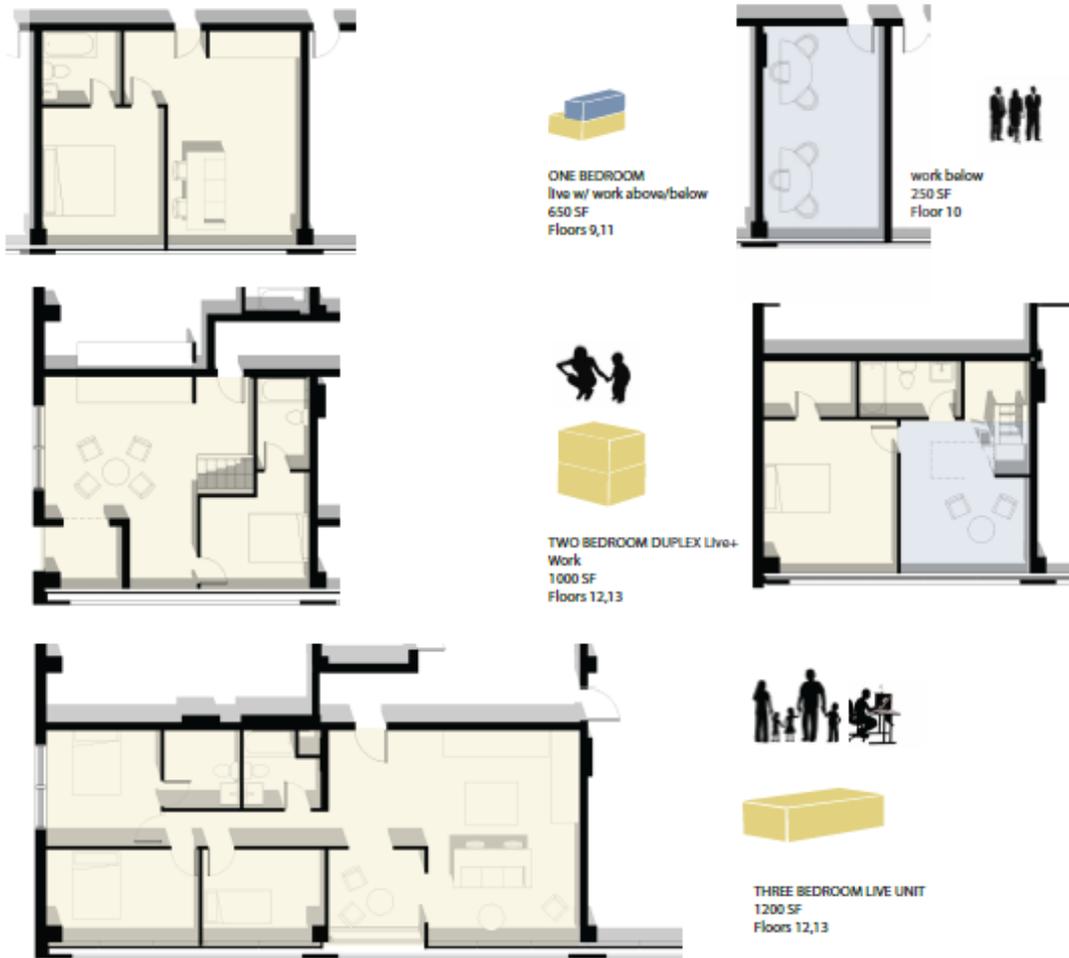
Variety of Apartment units, Floor Plans Part-2-2
